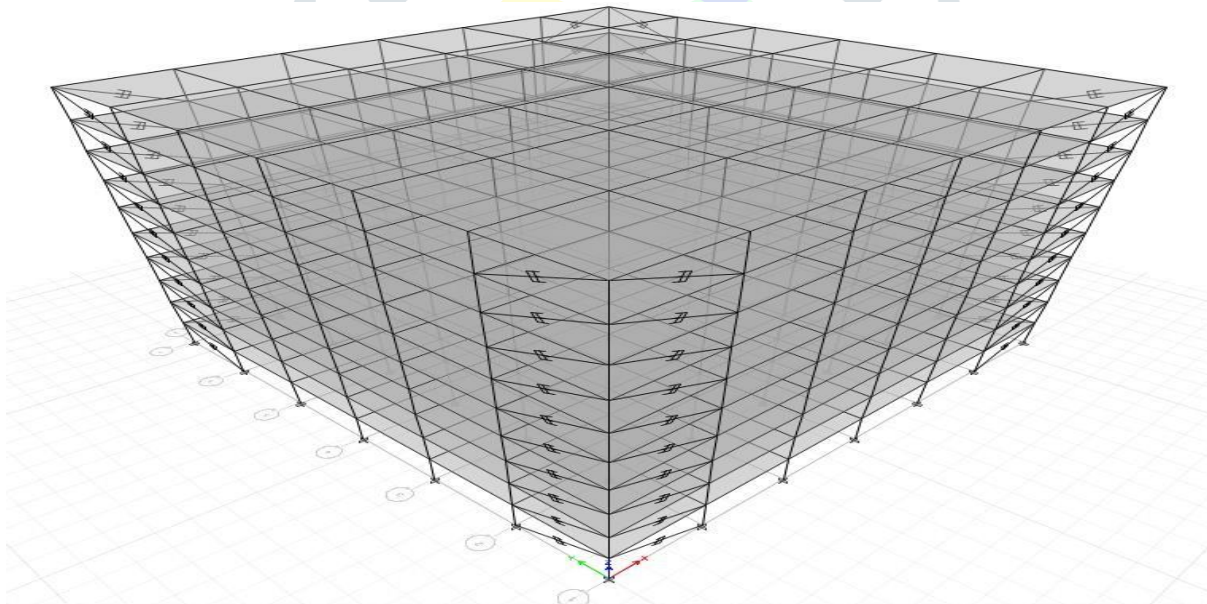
SBSC with FVD at Exterior Corners Isometric View.
